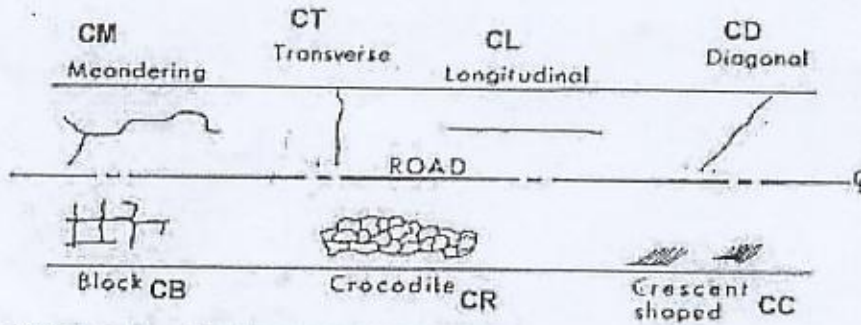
CRACKING OF FLEXIBLE PAVEMENTS
